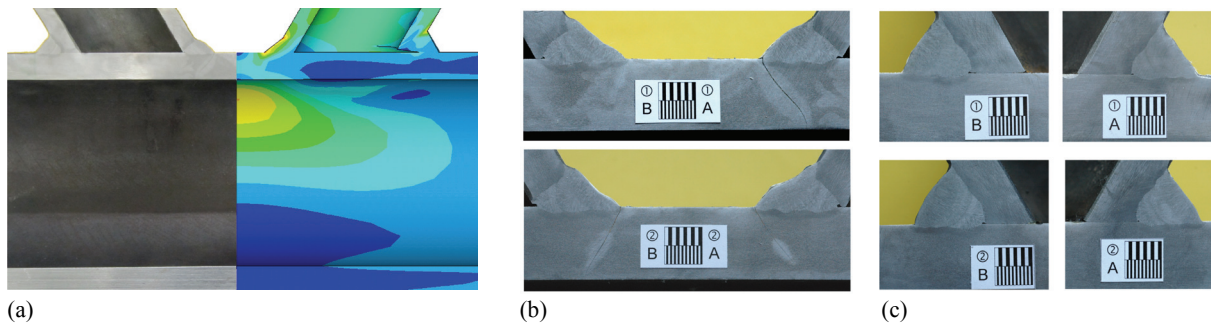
FE model with *Von Mises* stresses (a), fatigue cracks at the weld toes in the gap region of test specimen No. 1 and No. 2 (b), fillet weld at the crown heel (c)
